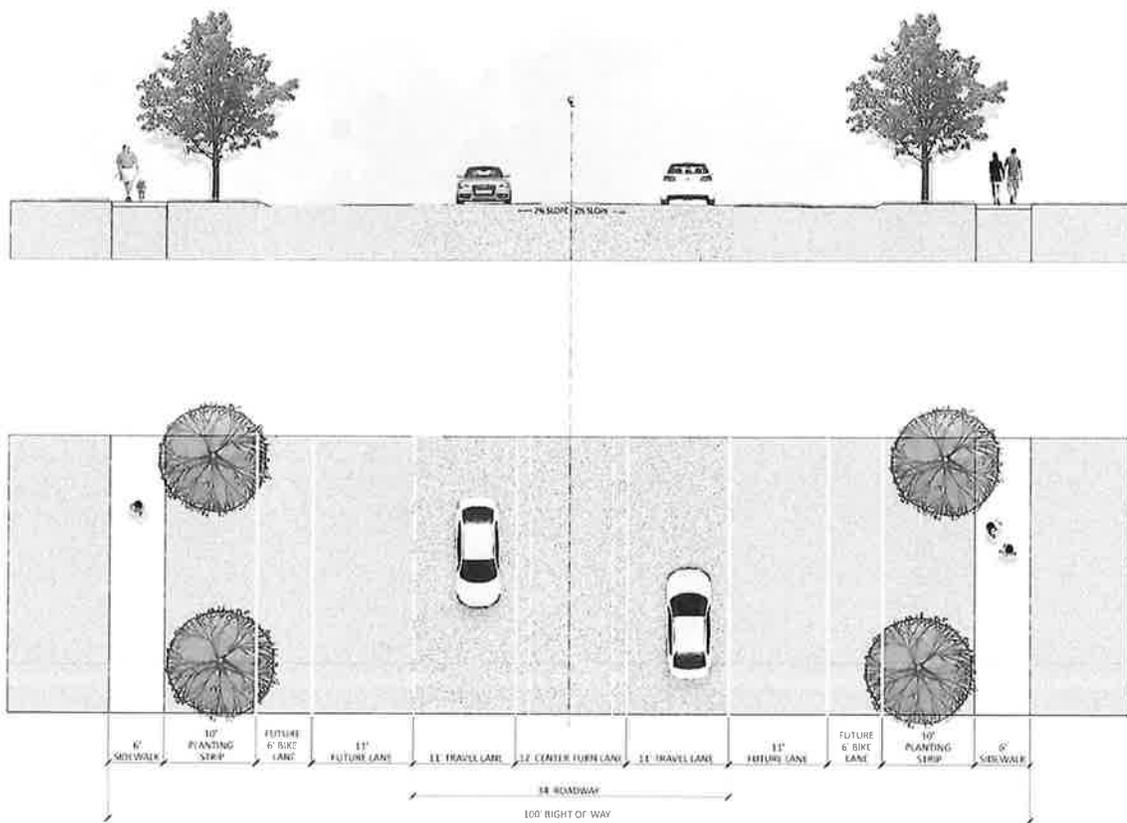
Minor Arterial – Full Buildout (100' ROW)
